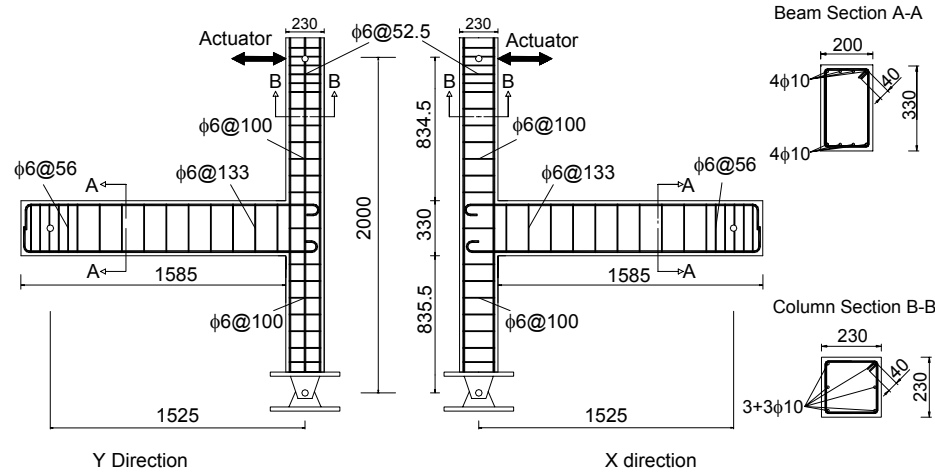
Geometry and reinforcement details of the 3D exterior (corner) joint specimens 3D-B (pre-1970 as built, benchmark) and 3D-GF1 (GFRP retrofitted)
